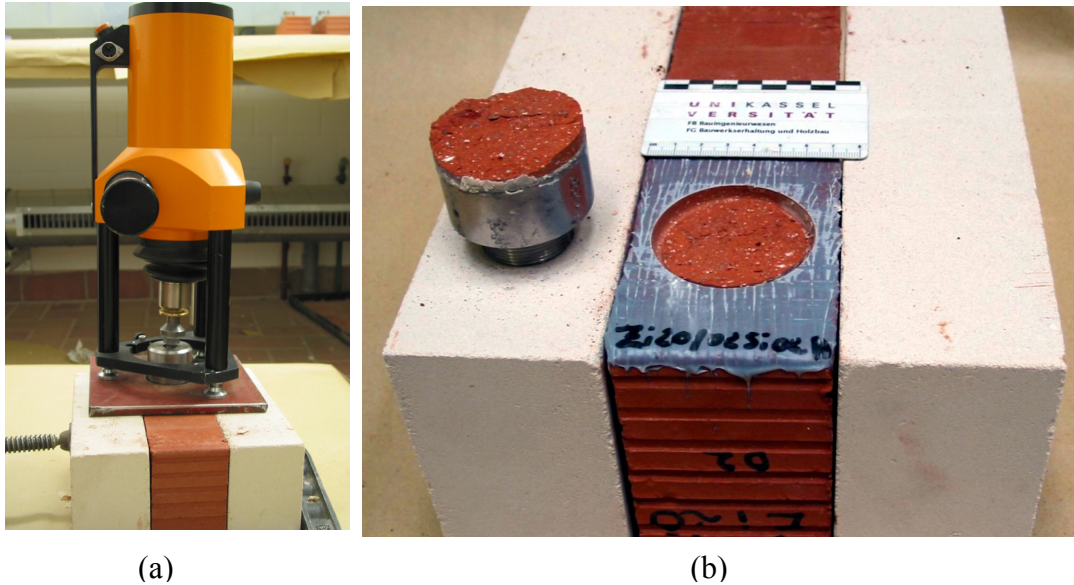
(a) tension test procedure with circular groove, (b) post test specimen with typical failure area
